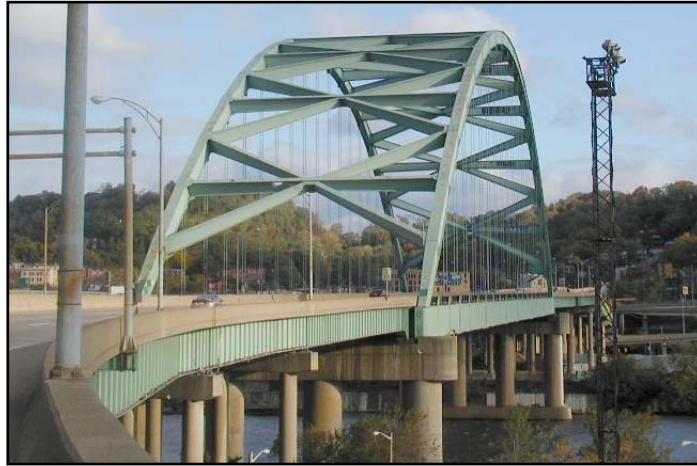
Photograph of East face of Birmingham Bridge looking north
